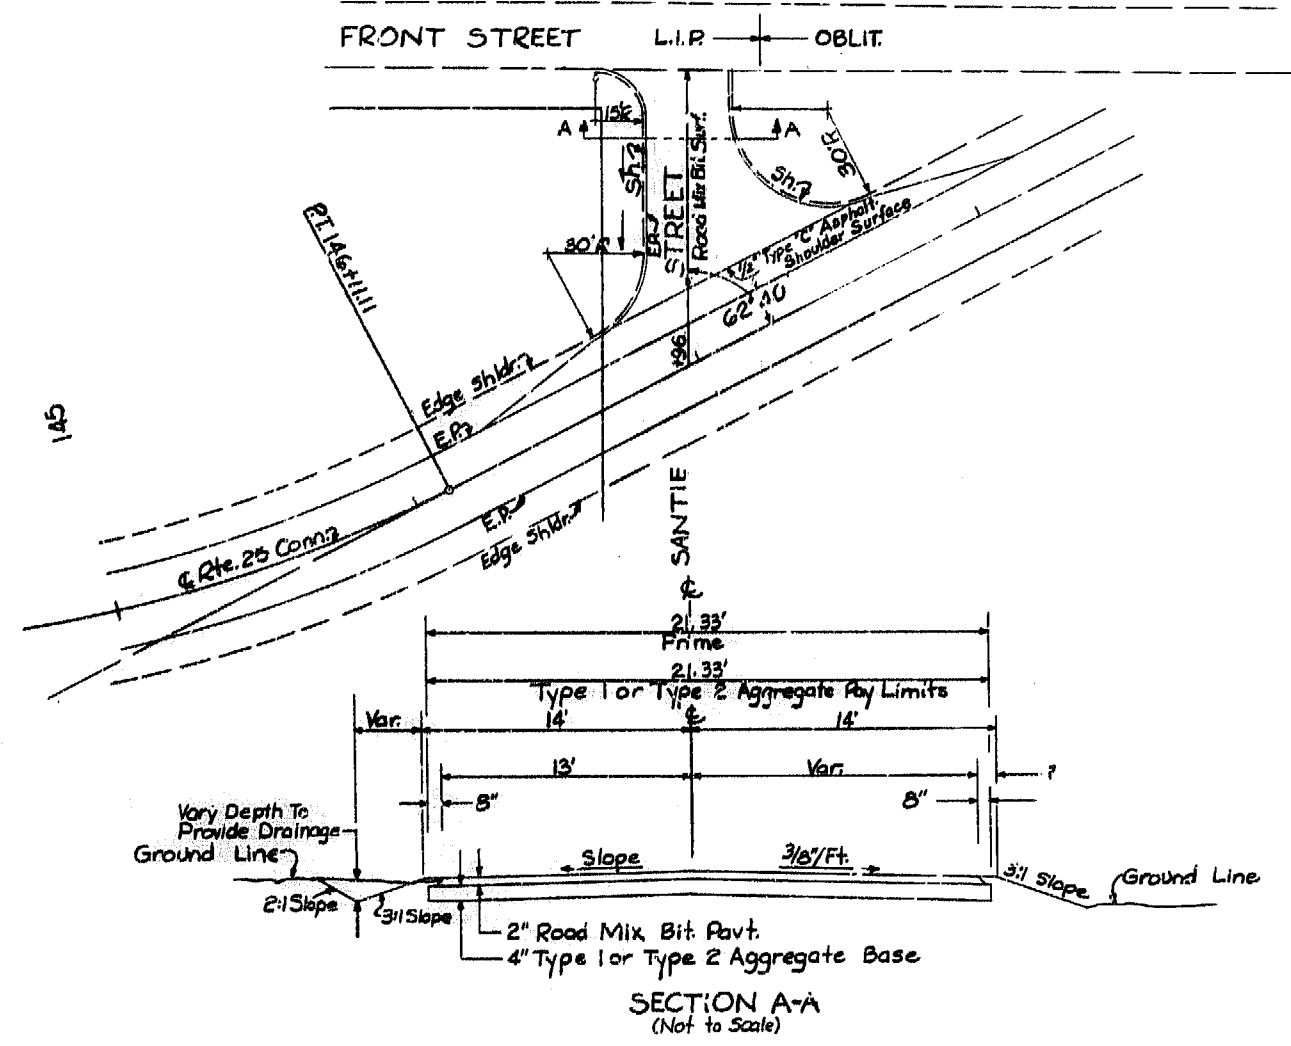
CONNECTION TO EXISTING ROUTE 25
